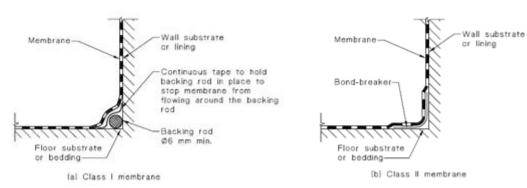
TYPICAL BOND BREAKER DETAILS
